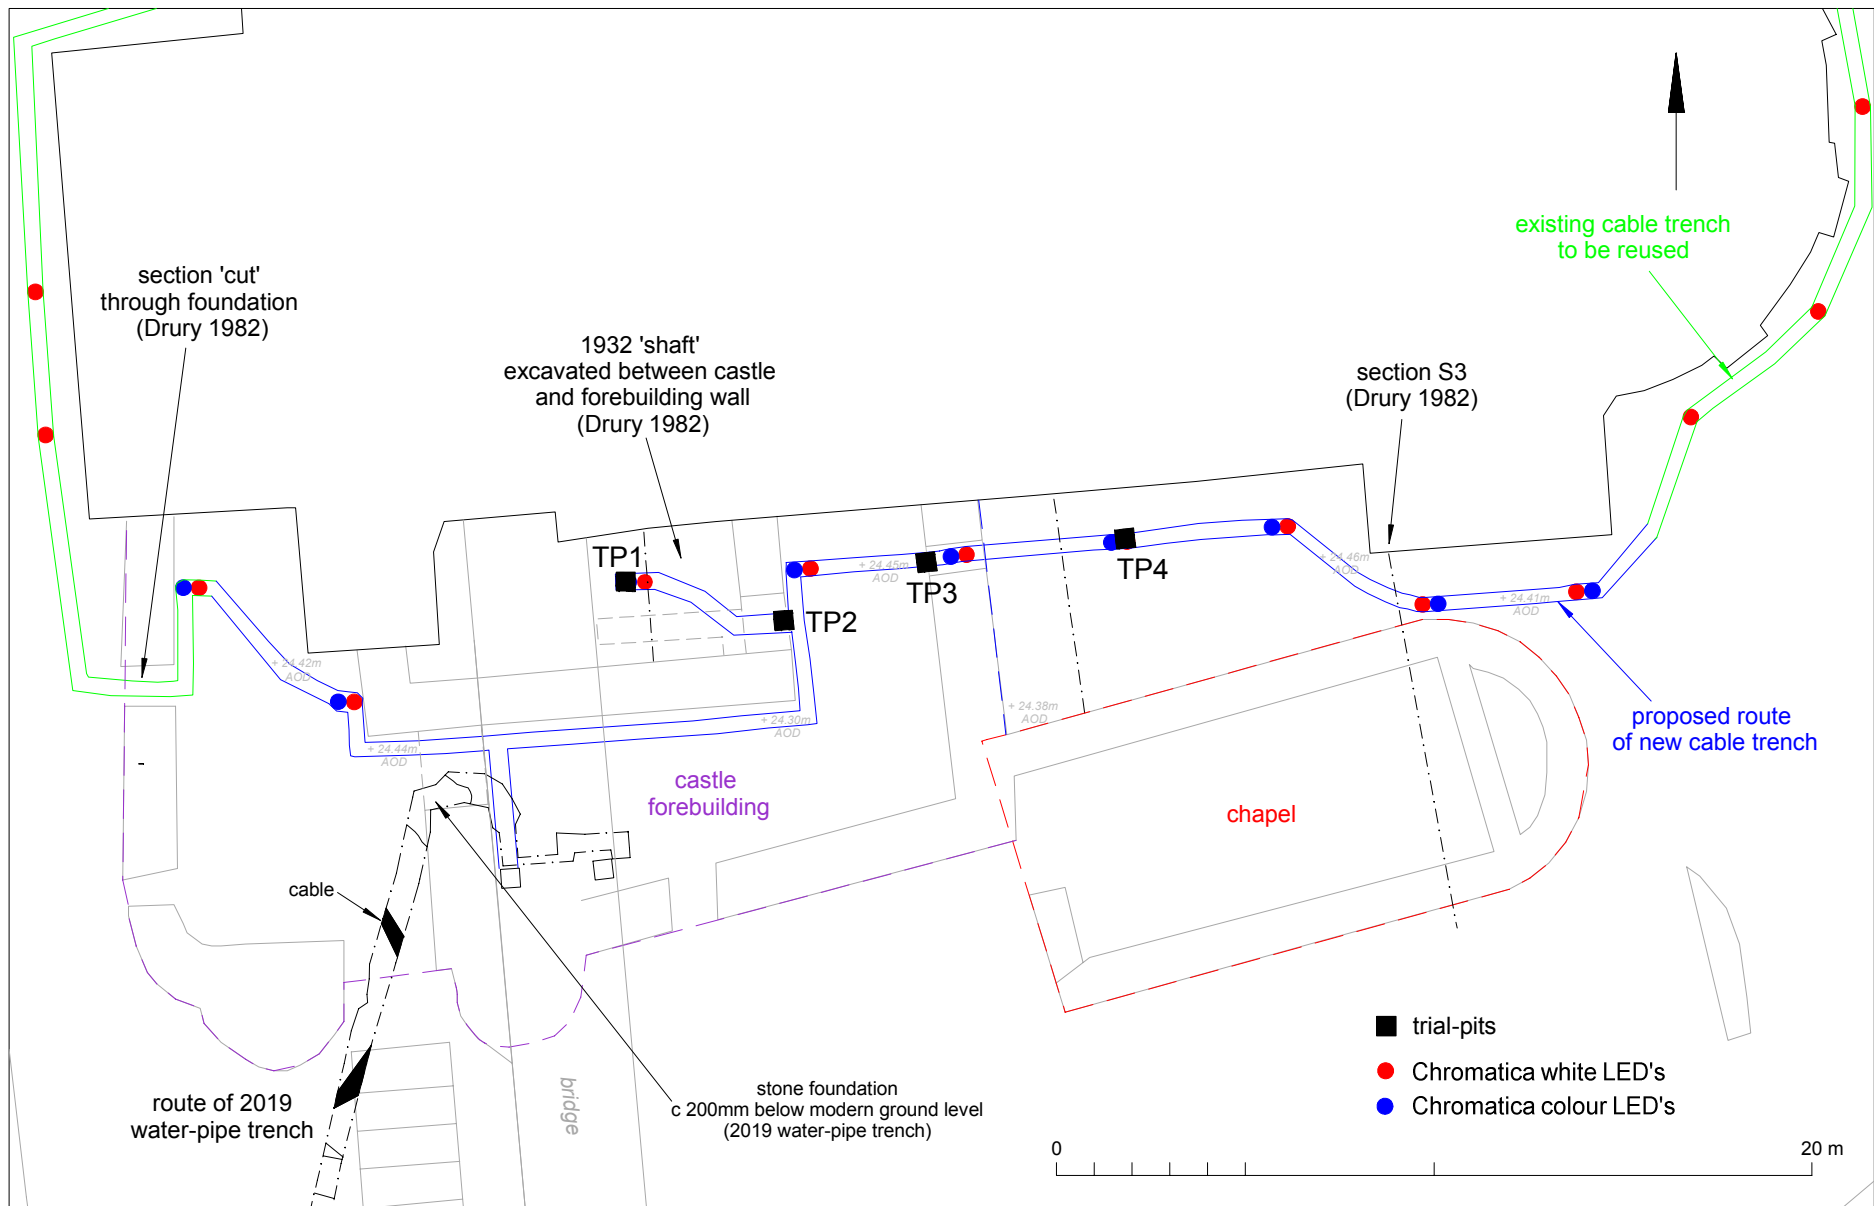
Proposed trial-pit locations in relation to known structural remains and previous archaeological excavations
